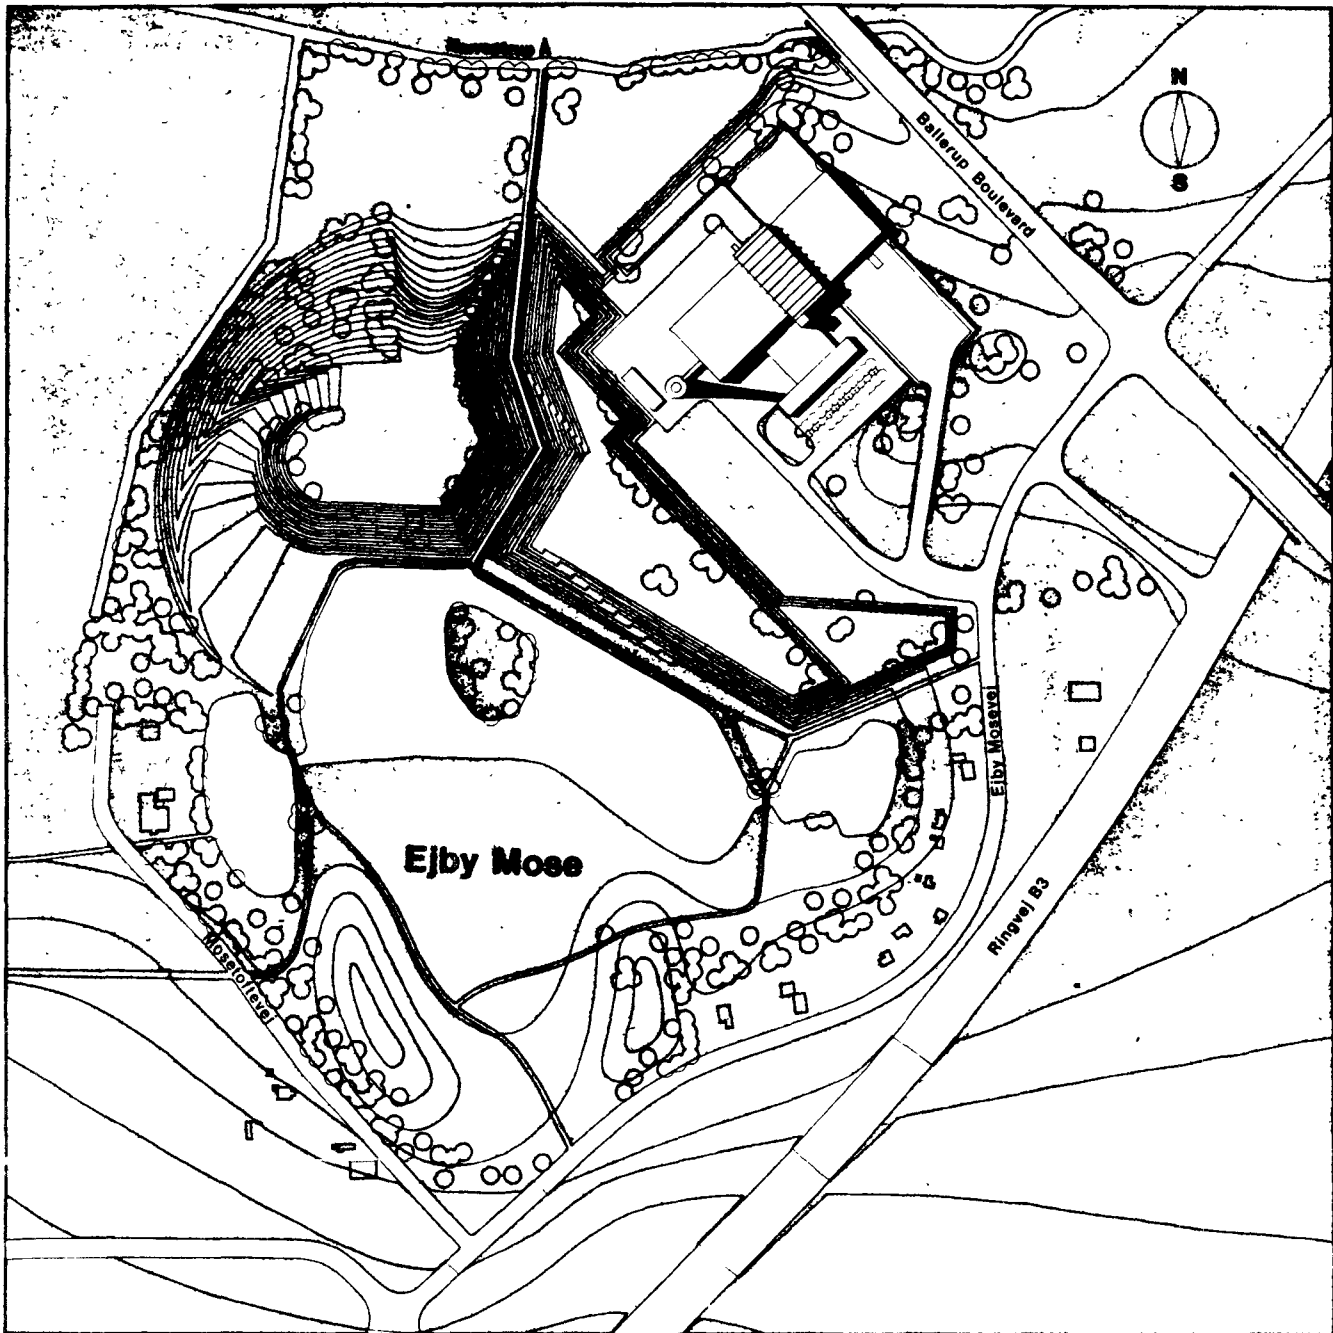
ARCHITECTS OVERHEAD PLAN FOR LANDSCAPING AT COPENHAGEN: WEST RFSG
